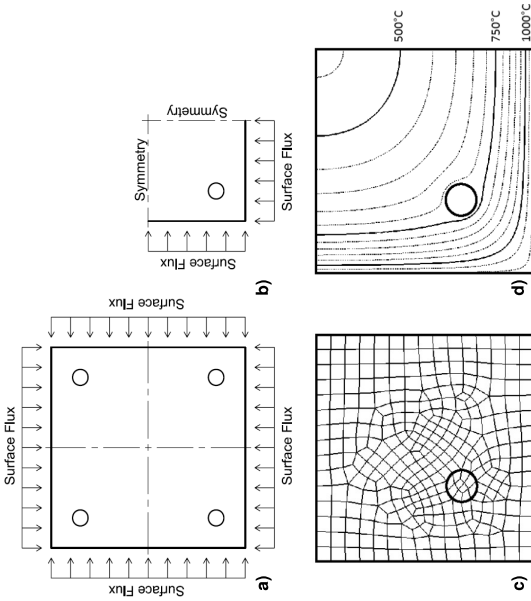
Cross section of reinforced concrete column studied: (a) cross section of column with surface heat flux; (b) quarter section model of column; (c) typical finite element mesh of quarter section; (d) example thermal profile of quarter section during fire.
